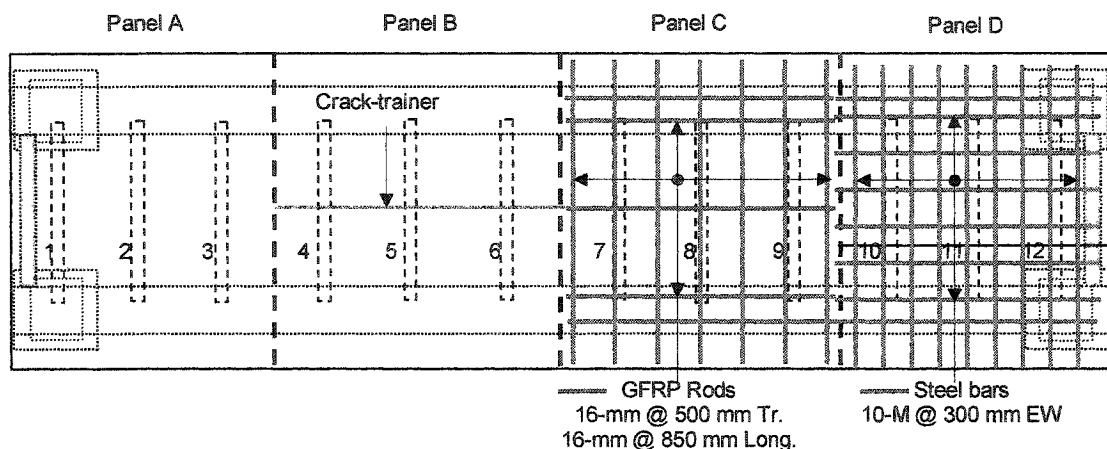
Layout of Crack-Control Reinforcement and Crack-Trainer
